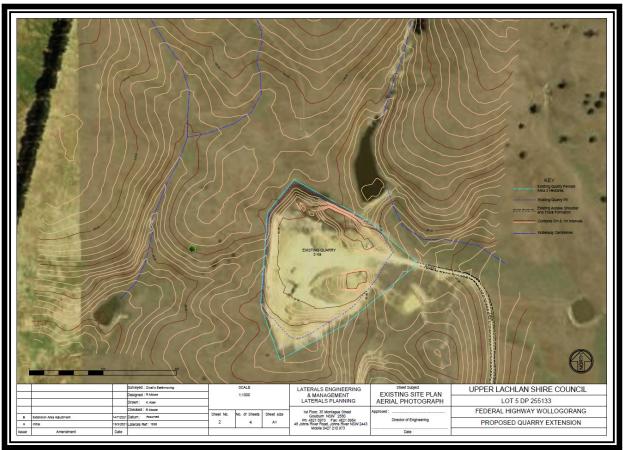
Existing Site – Aerial Photograph (Plan Source: Laterals Planning)
